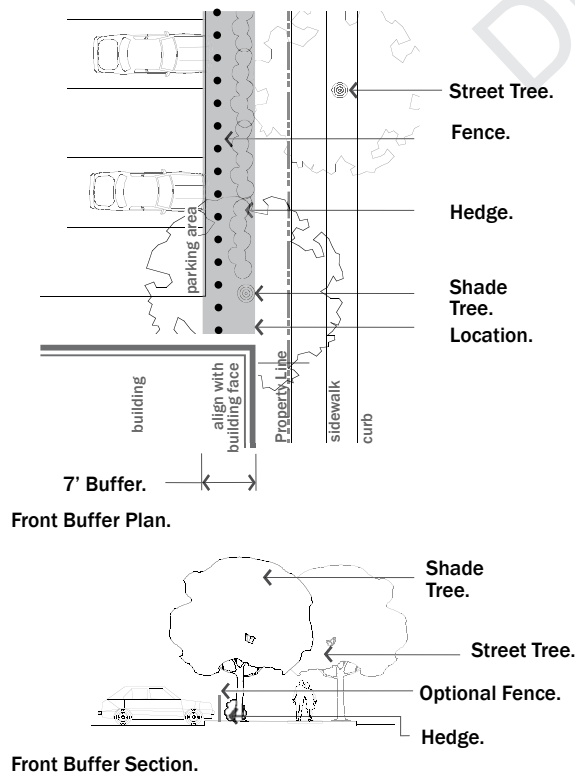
C (1). Frontage Buffer Plan and Section.
